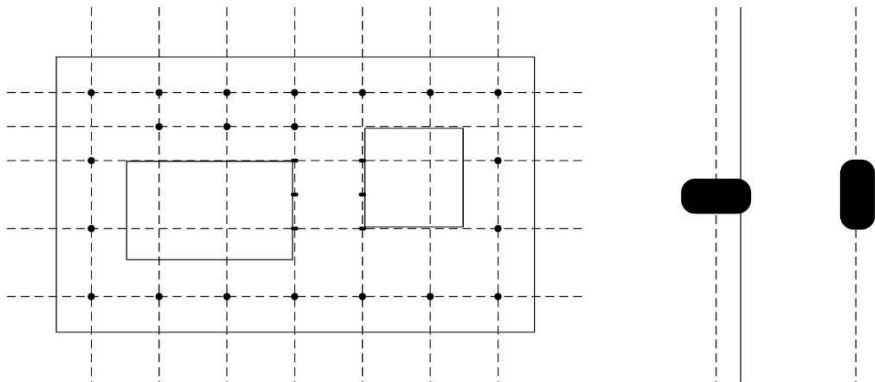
Two-dimensional digital representation of Stirling's design showing the structural grid in relation to the columns in plan (left). Zooming into the central section reveals how the column protrudes past the façade (centre right). This was resolved by rotating the columns by ninety degrees (far right).
